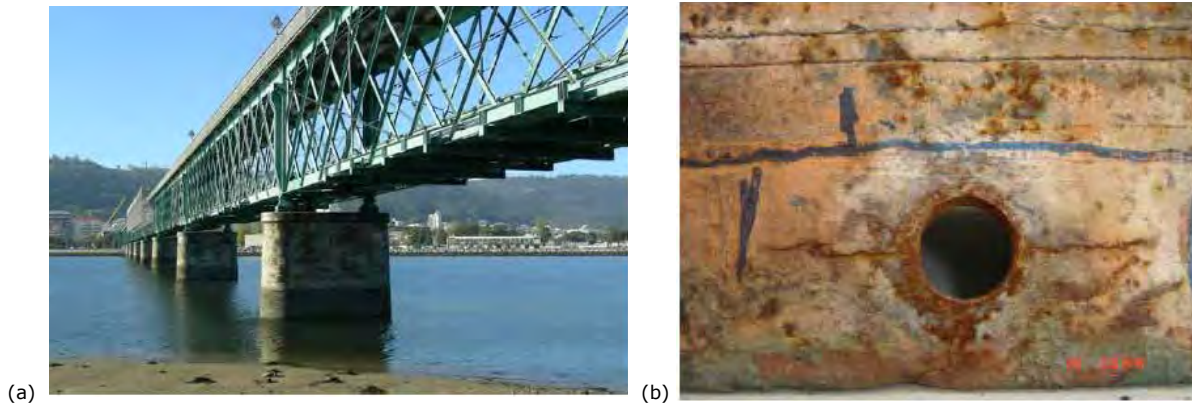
(a) Eiffel Bridge in Viana do Castelo; (b) Fatigue crack found in a structural element of the same bridge
